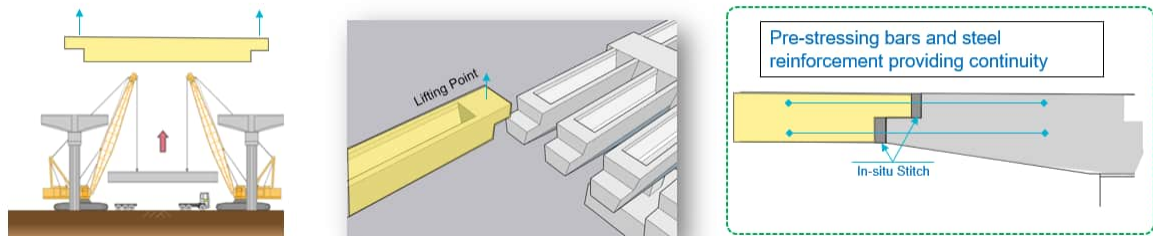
Lifting and connecting pre-cast U-beams to RC crosshead
